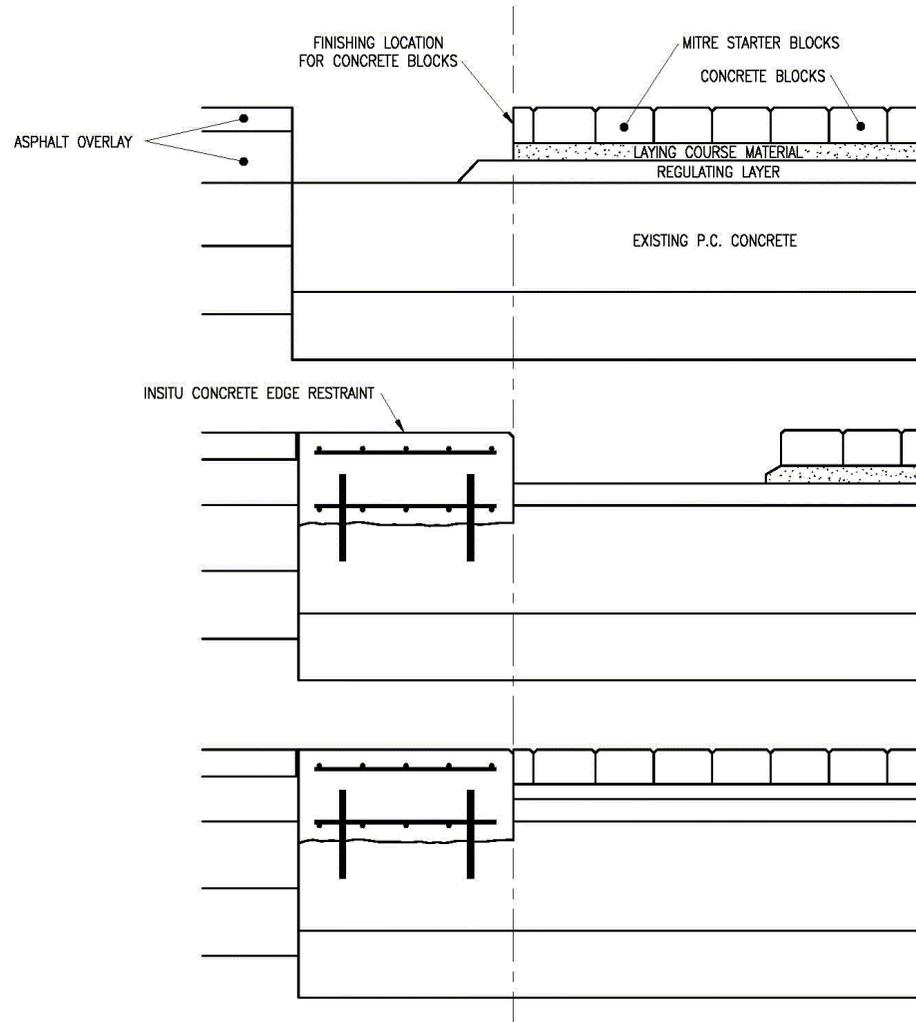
In Situ Concrete Edge Restraint Fixed to Existing Concrete Pavements
